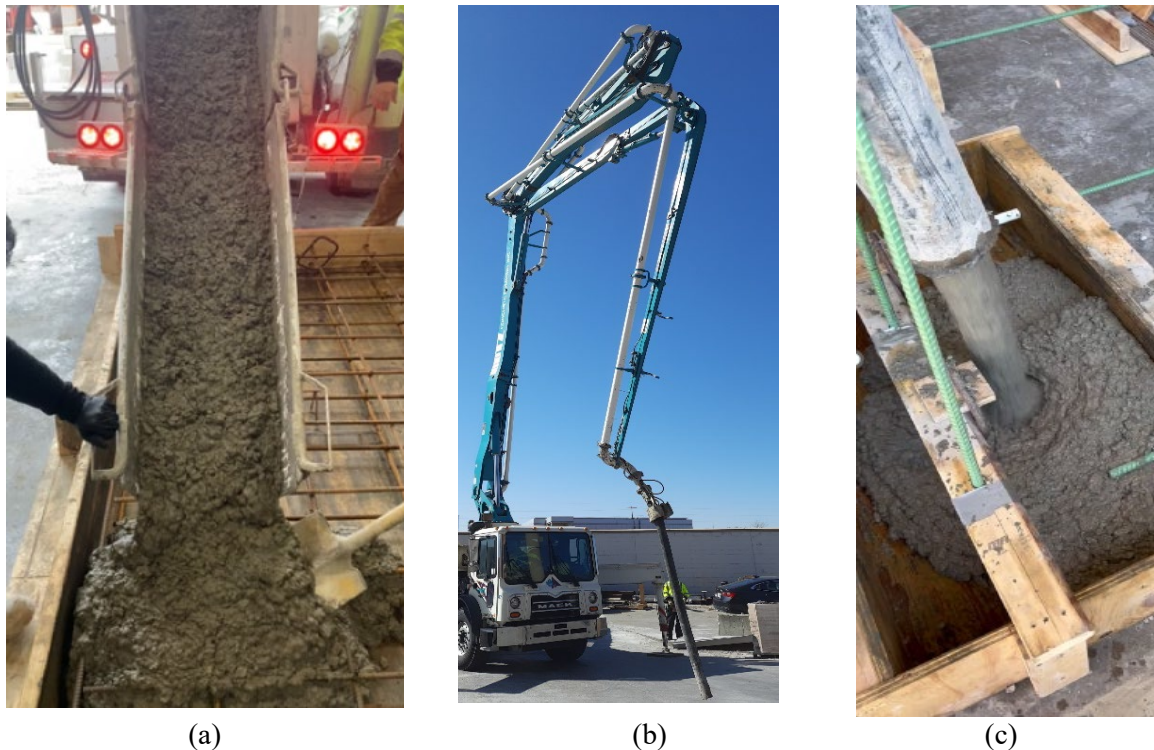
(a) Concrete placement using truck chute, (b) 100-ft long pump hose, and (c) concrete placement using concrete pump
